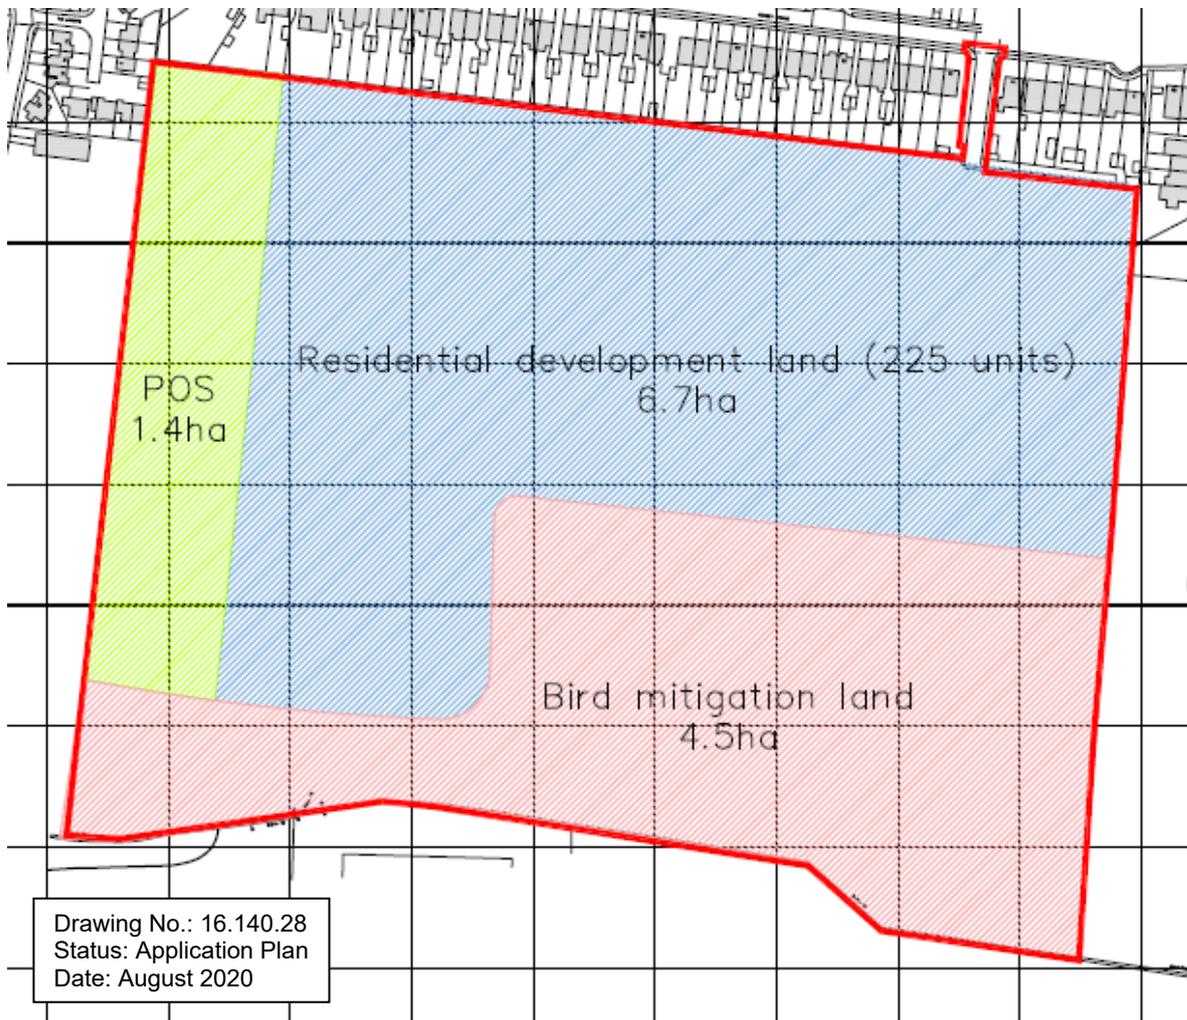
The Proposed Development – Illustrative Masterplan Layout
